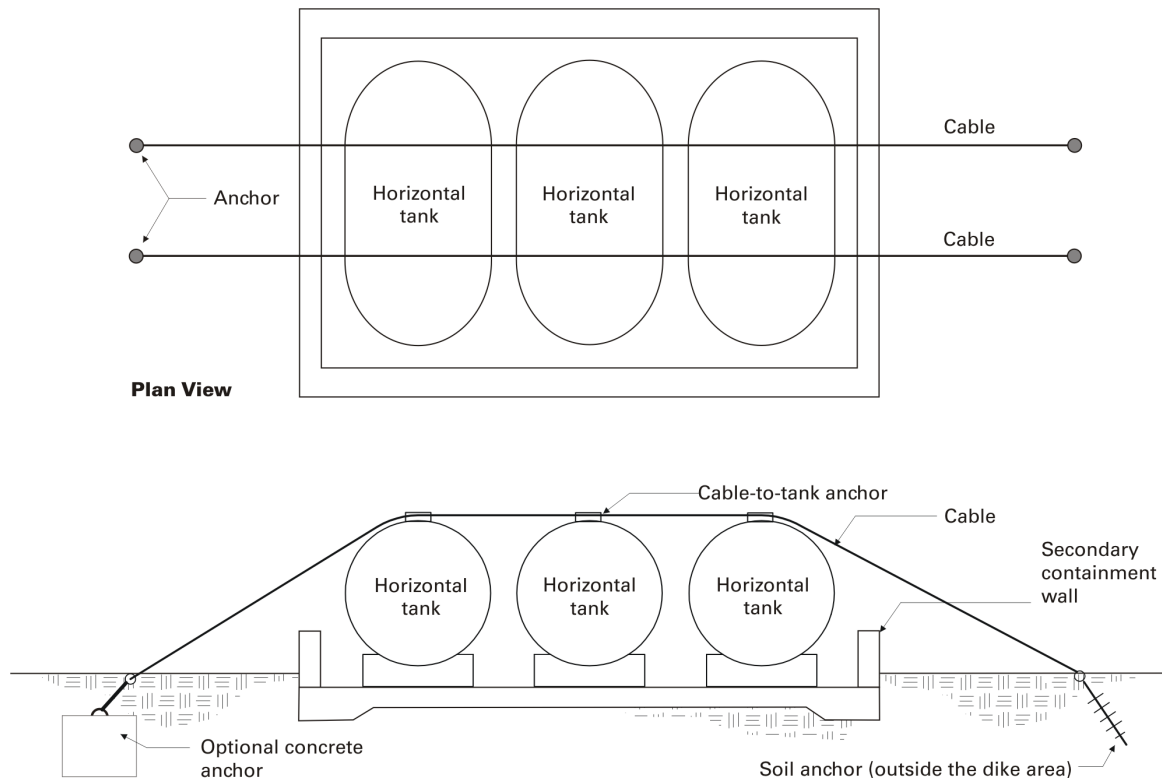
Cable anchors located outside the secondary containment structure for horizontal tanks.
